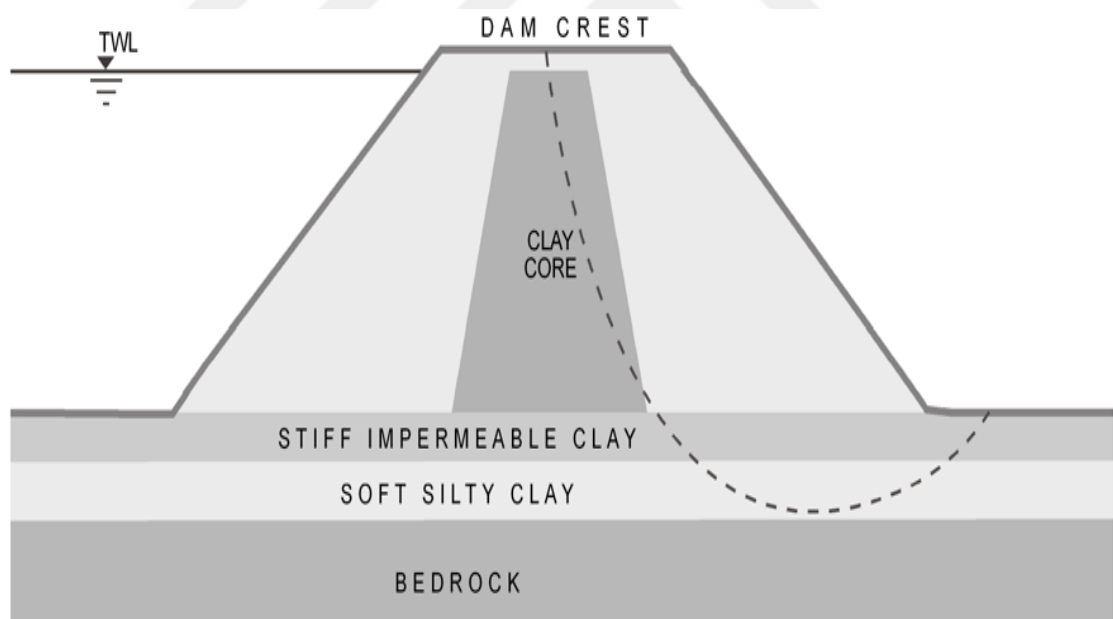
Structural failure of embankment dam (load exceeded) [4].
